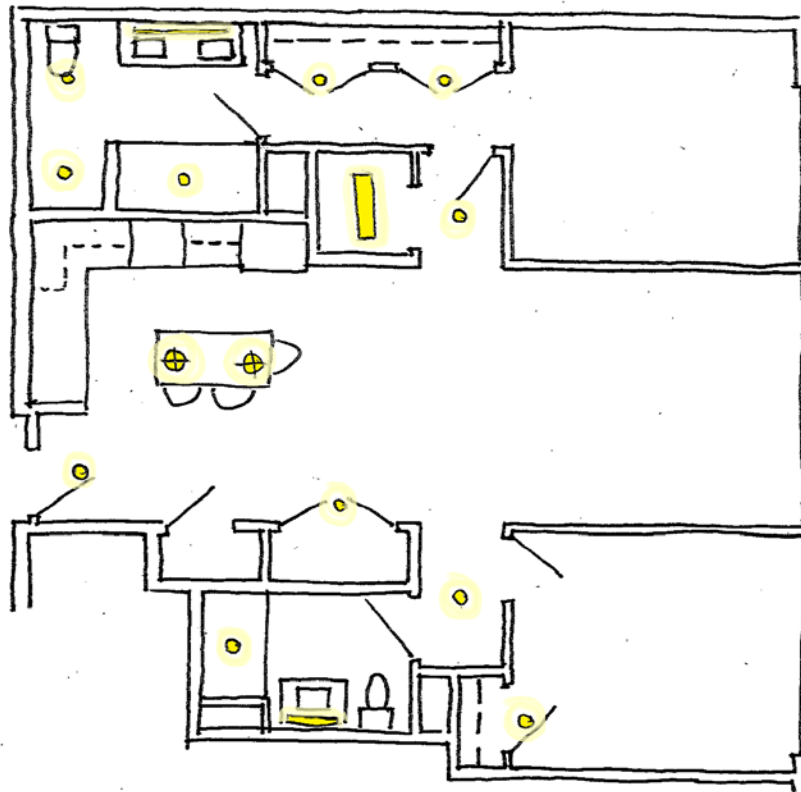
(LD17) Typical Dwelling Unit Layout
